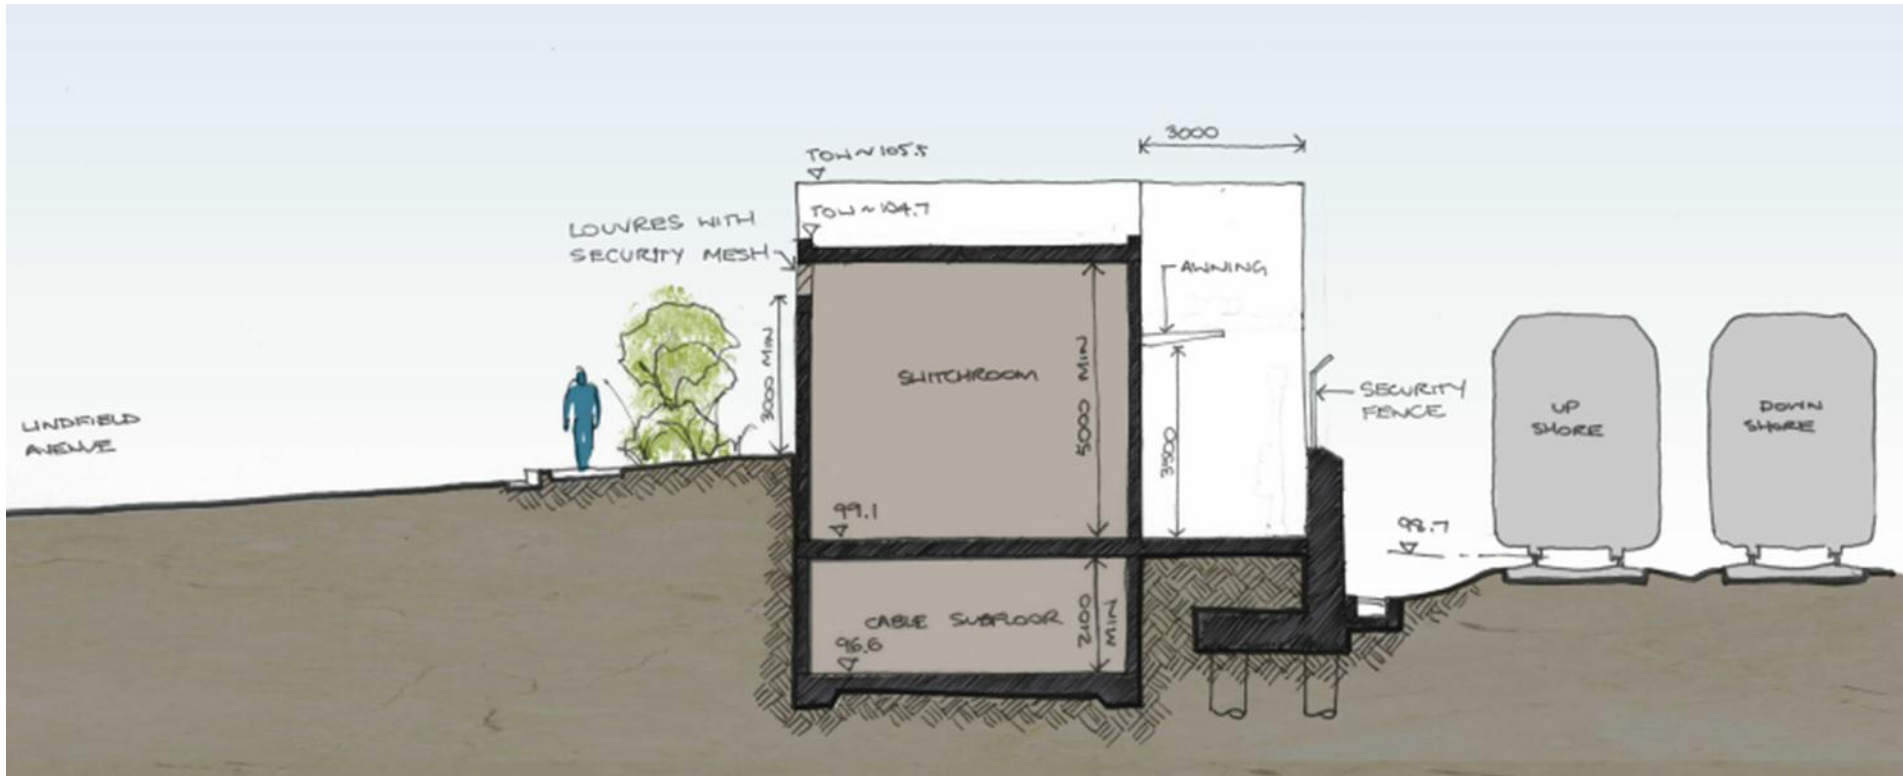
Indicative layout of the proposed Lindfield substation
